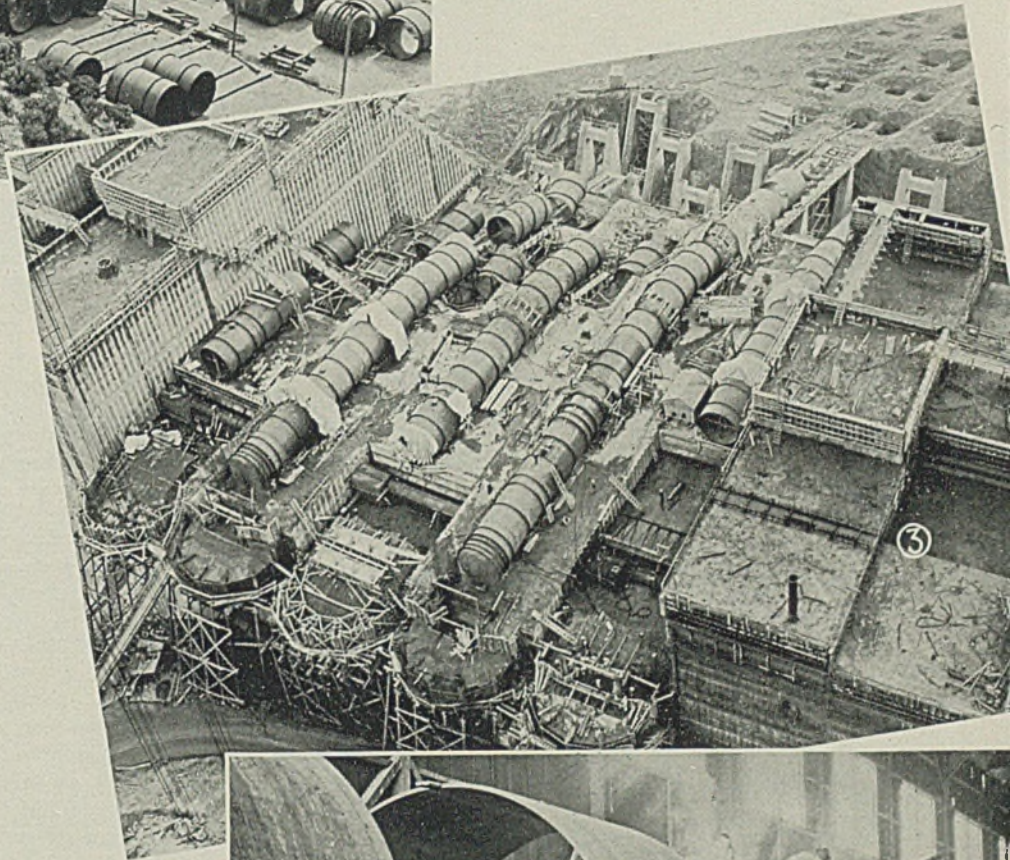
Here the penstock sections are being placed in the dam. At every point where a penstock section crosses a contraction joint between the 50-foot concrete blocks, a slip joint is installed in the penstock to be welded solid from the inside after the concrete has cooled and the contraction joints grouted. Note the supporting pillars and pits for other supports leading off to the right rear
